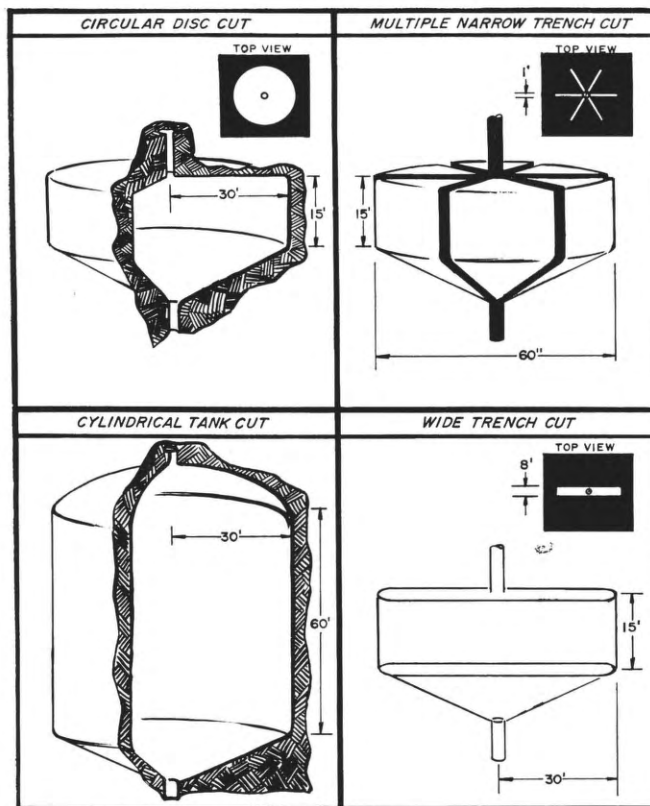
Subsurface excavations that could be made with the borehole mining tool.
